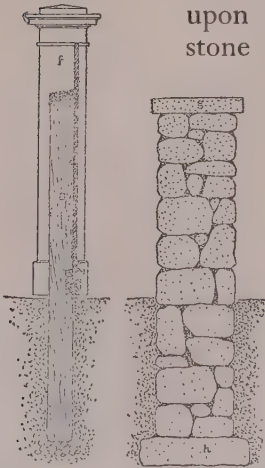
Sections of simple wooden picket fence and rough stone wall
